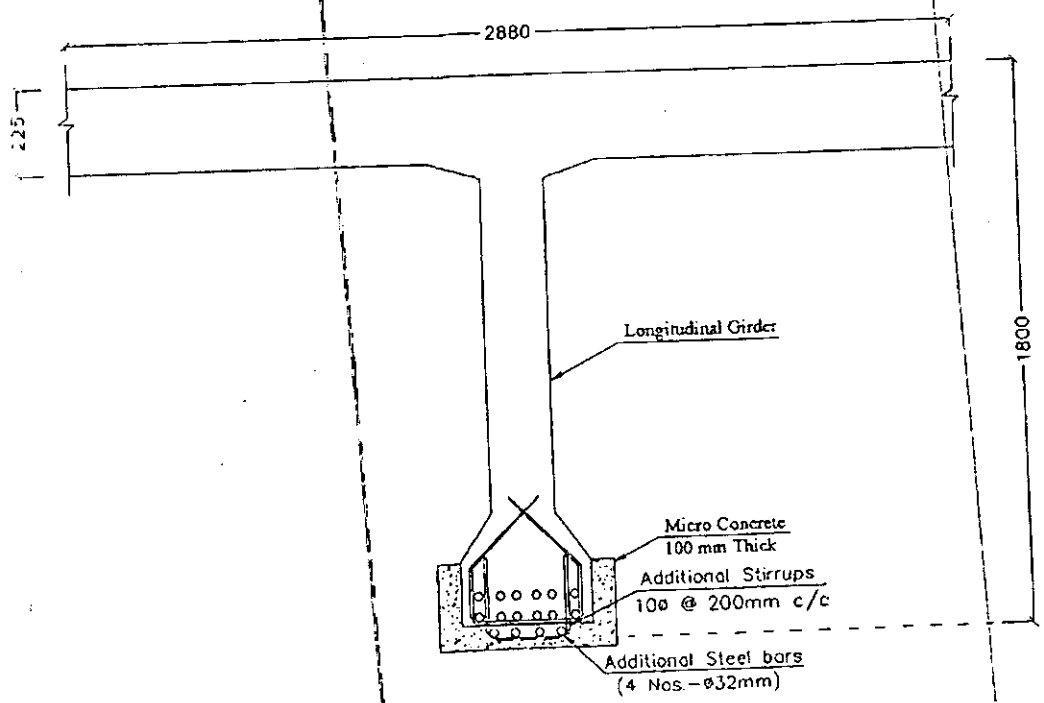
FLEXURAL STRENGTHENING OF GIRDERS BY CONCRETE JACKETING
